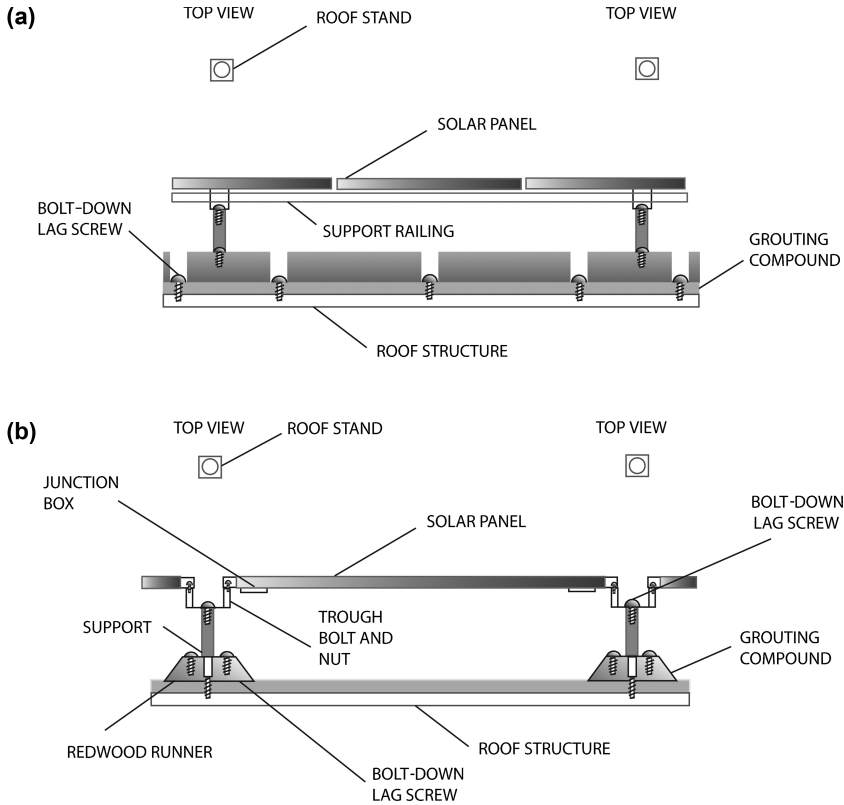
Typical roof-mount solar power railing installation detail. (a) Side view. (b) Front view. *Courtesy of Vector Delta Design Group.
